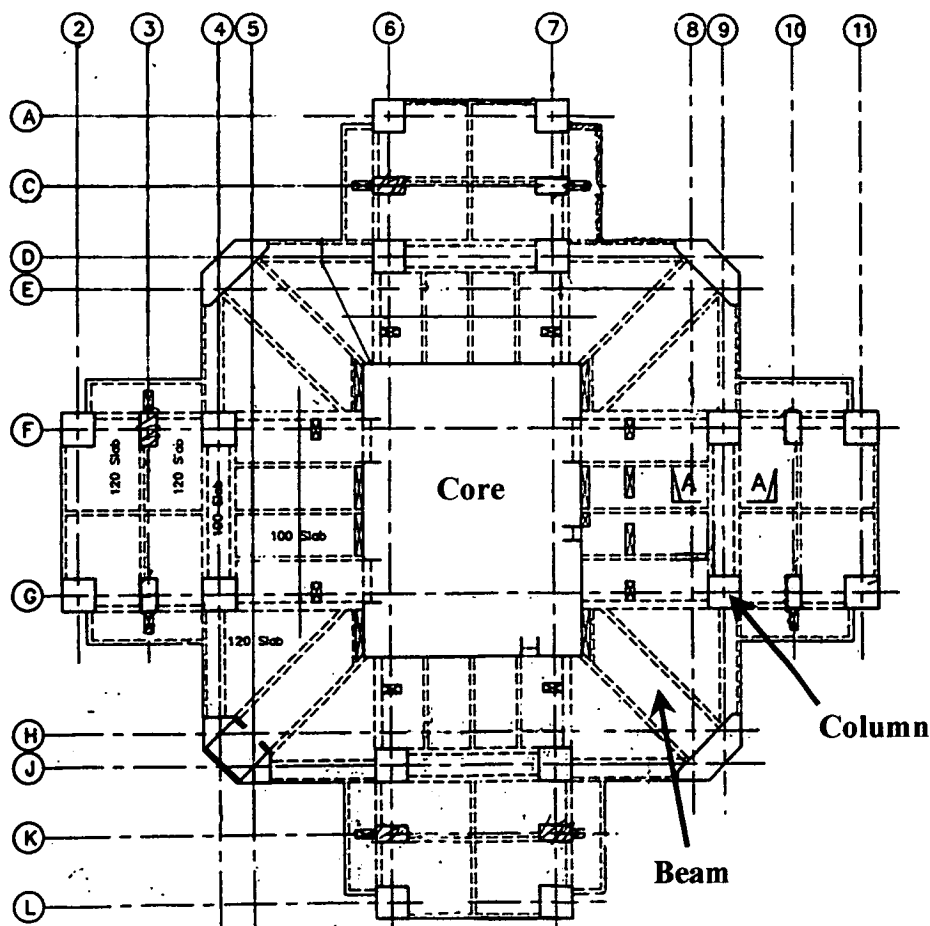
Typical lower floor plan, Bayoke Tower II, showing column, core and beams.
